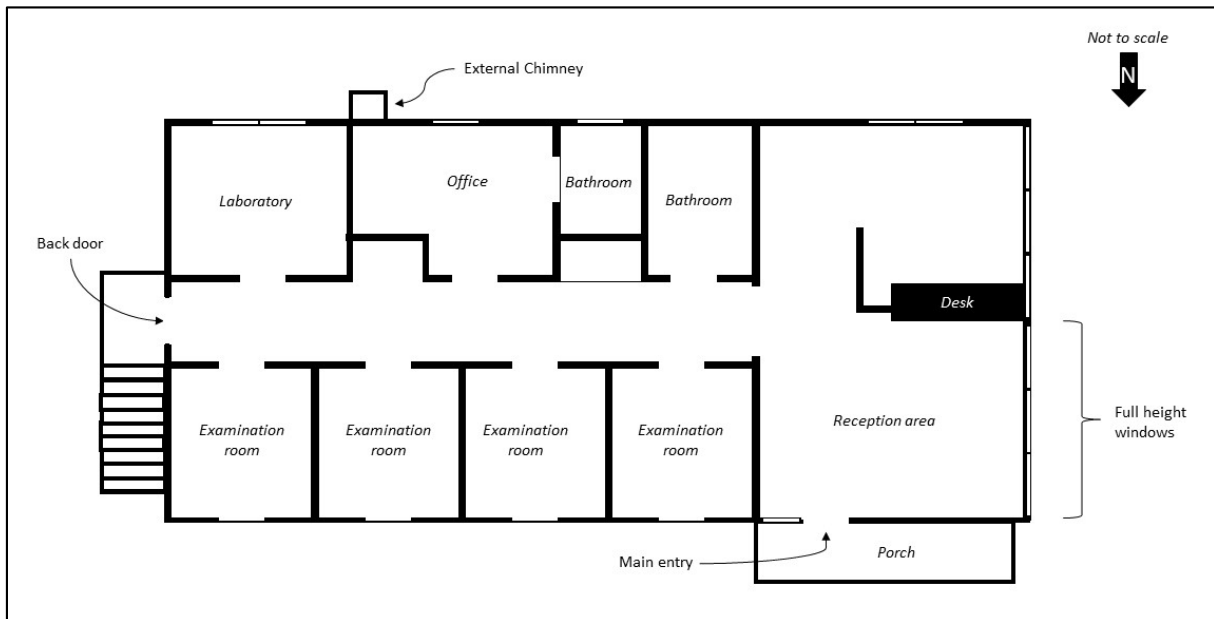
Ray Dental Office Building first floor plan sketch, not to scale.
